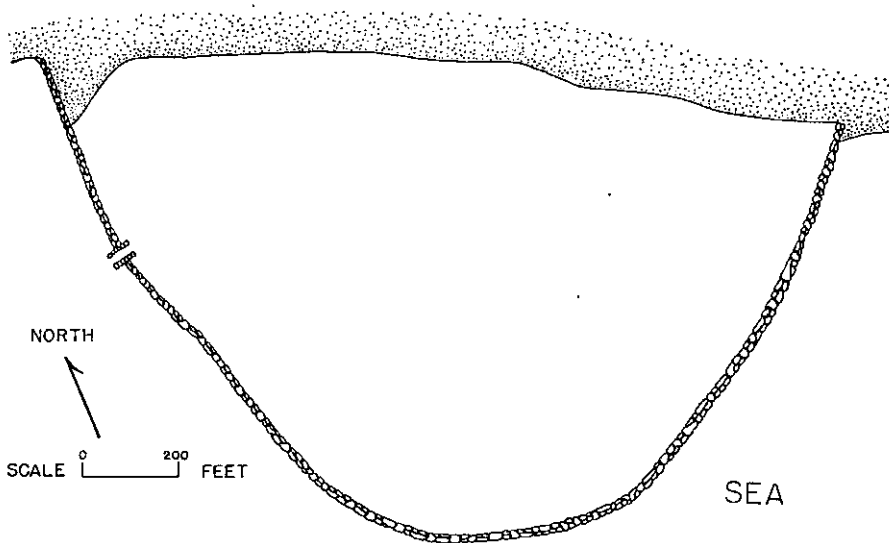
Plan of a *loko kuapa* made by constructing a wall from two places on the shore line to form a semicircular enclosure. Ali'i Pond, Makakupaia, Molokai; area, 25.80 acres. (Plan adapted from Evans, 1937.)
